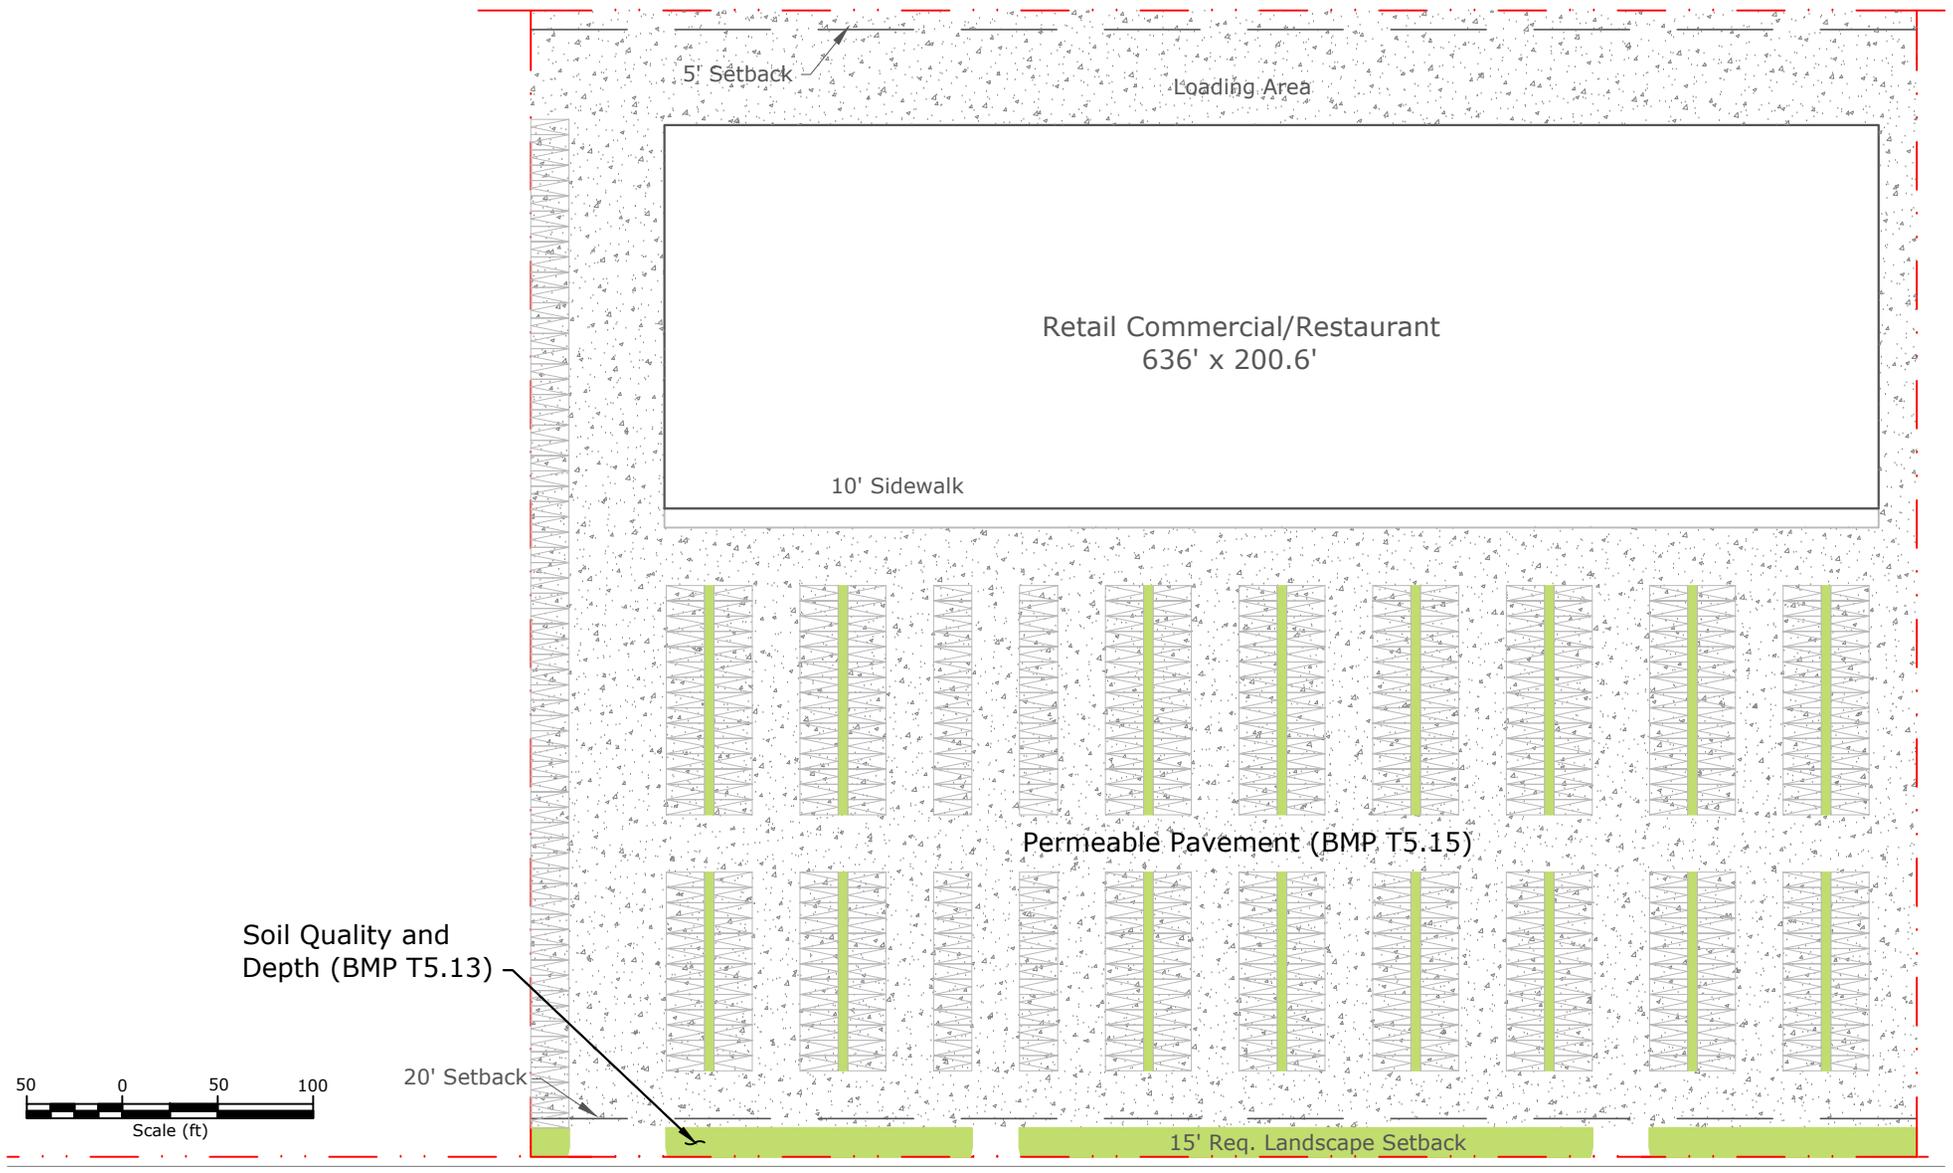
Scenario 13. Permanent Stormwater Site Plan – Large Commercial Development, 2012 Requirements, Outwash Soils
